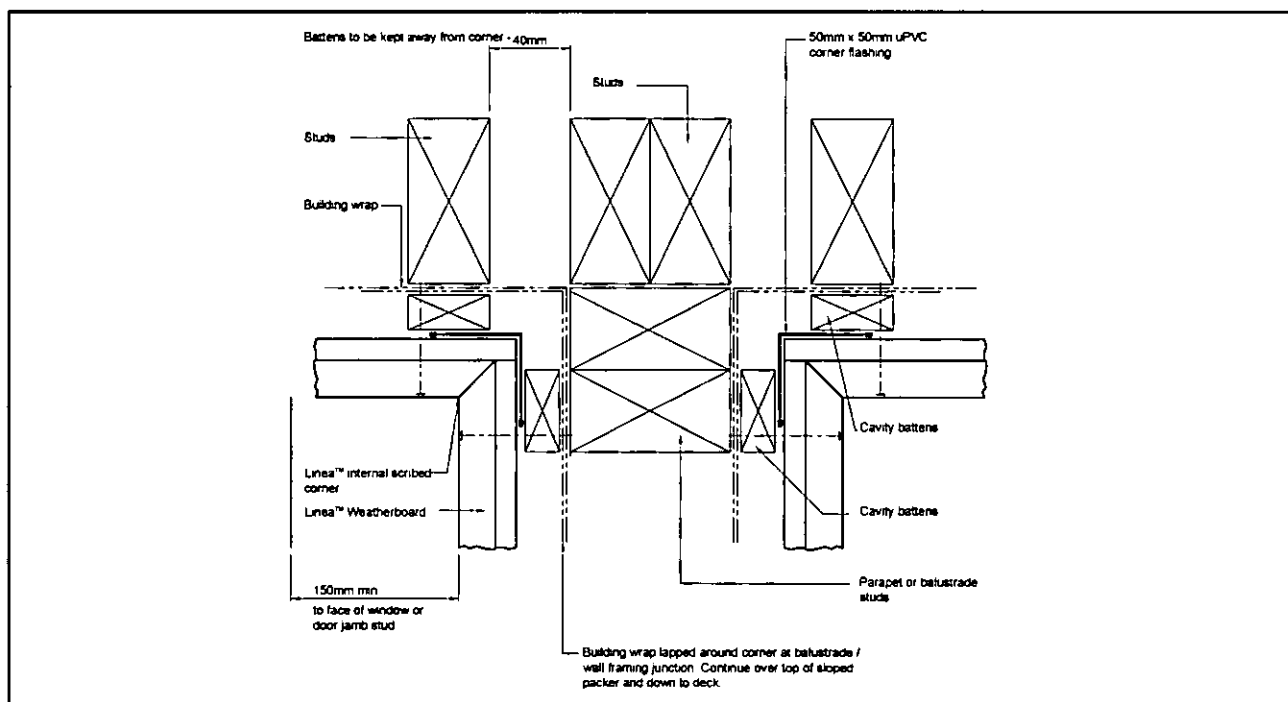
CAVITY ENCLOSED DECK BALUSTRADE TO WALL
